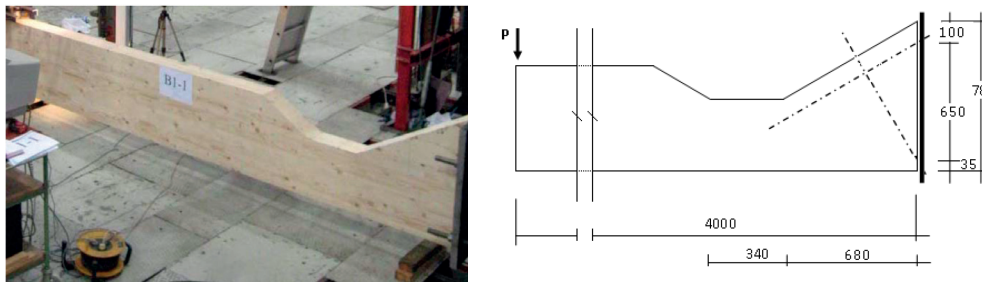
The test set-up for a cantilever beam connected by LTRs, [70]
